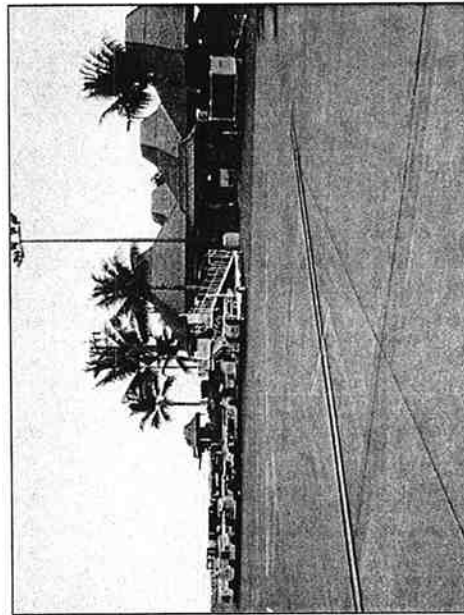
Photo of existing tarmac facilities within Improvement Area 7; view to the northwest
